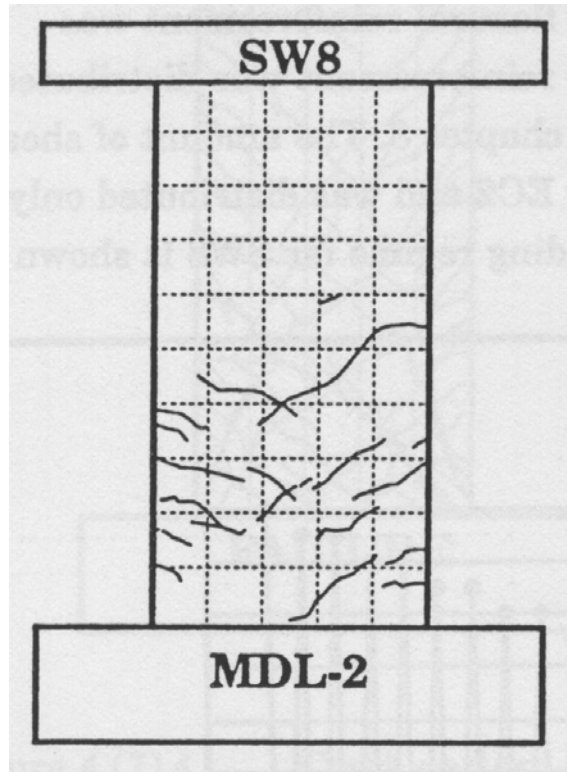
Condition of wall SW8 at 0.17% drift [Pilakoutas (1991)]
